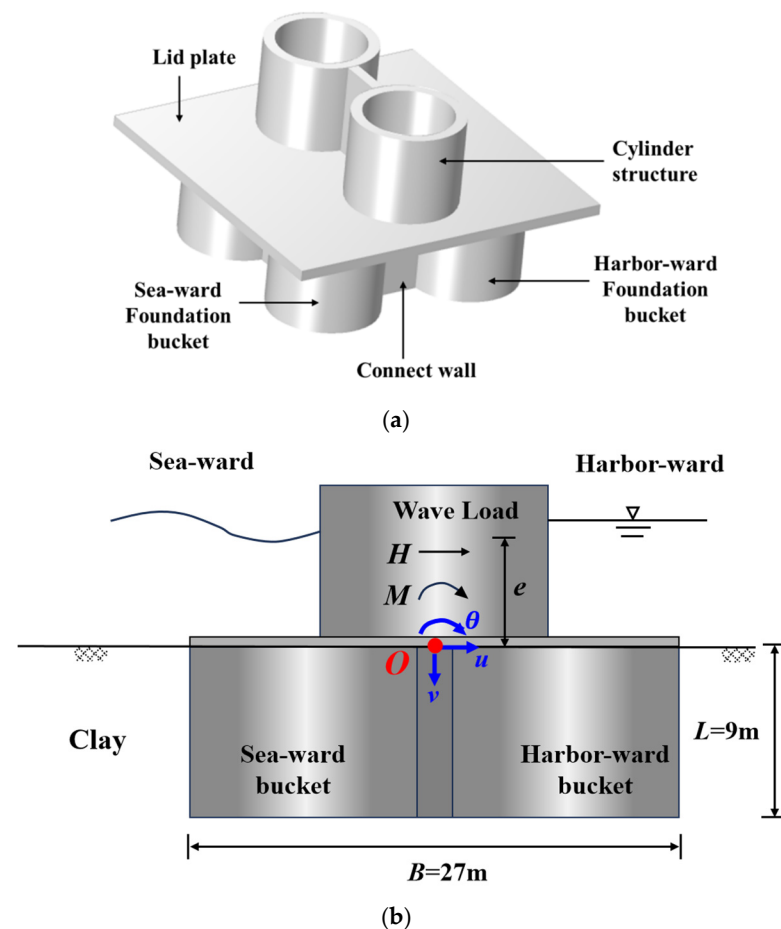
Composite bucket foundation breakwater. (a) Composite bucket foundation breakwater model. (b) Sketch of composite bucket foundation breakwater under storm wave load.
